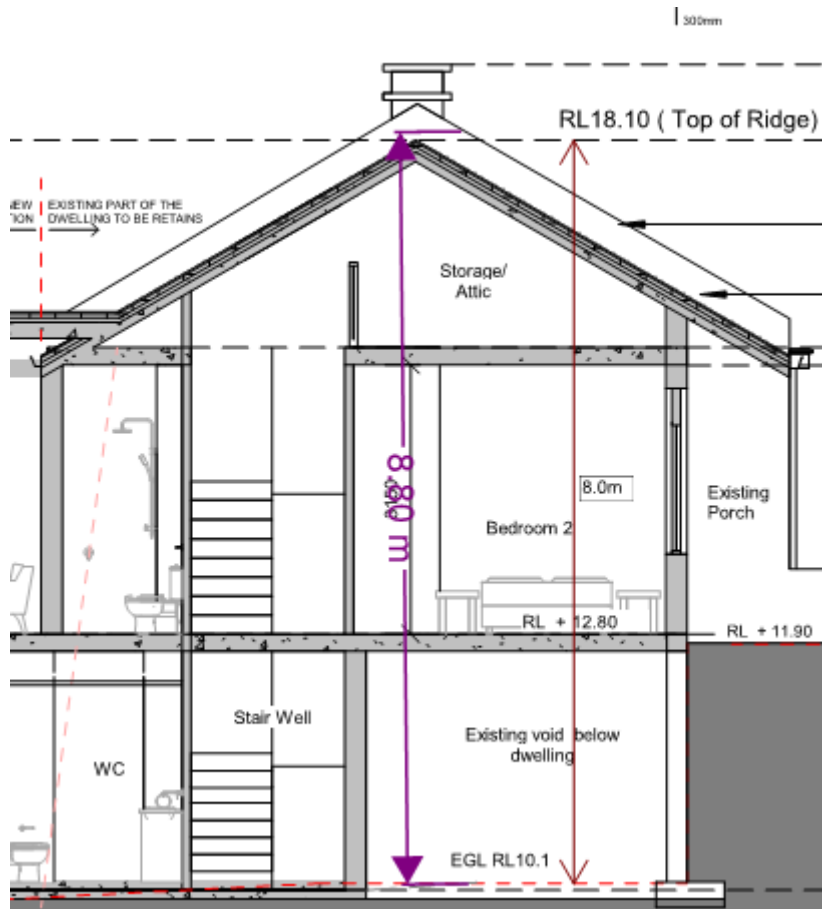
Extract of the architectural plans showing the maximum proposed building height at a determined point
